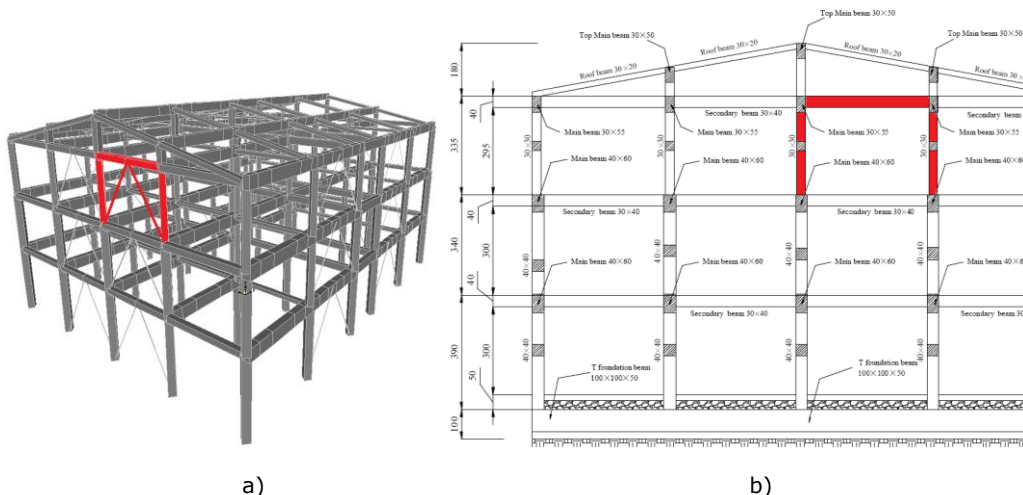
RC frame location: a) 3D view; b) plan view of the third floor
